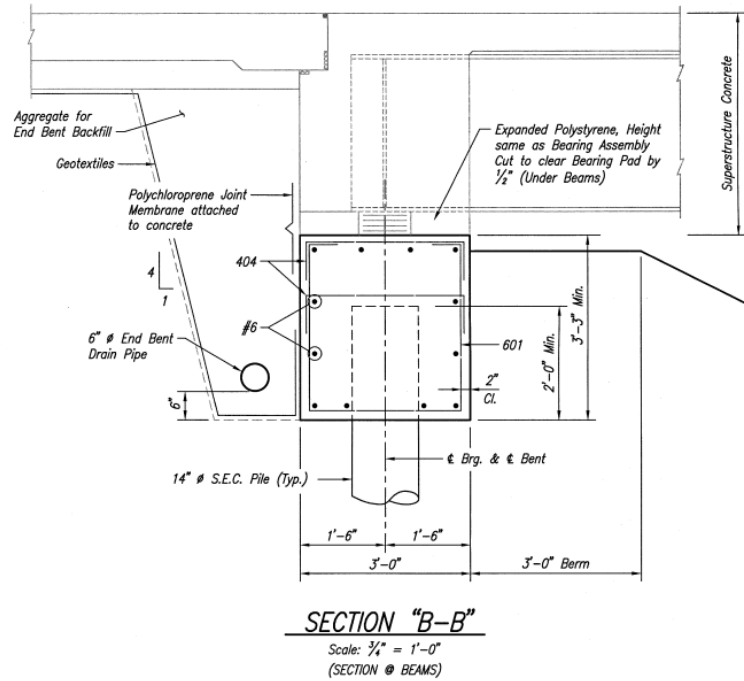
Abutment Detail of the Bridge (NBI 41130) (2015)
